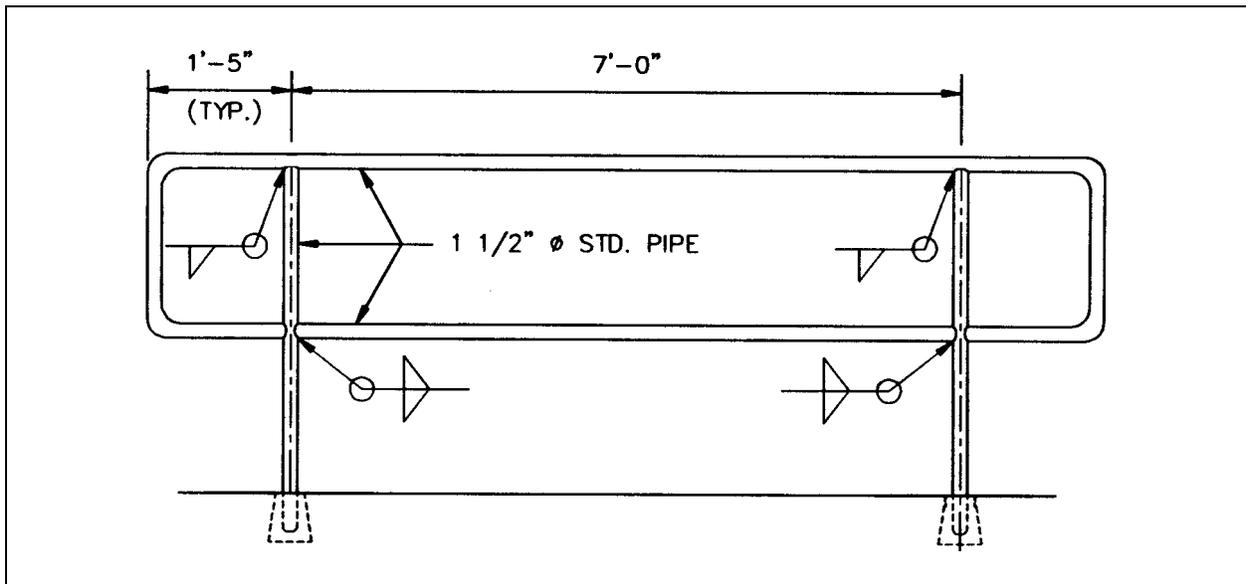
Steel handrail schematic (1 in. = 2.54 cm; 1 ft = 0.3 m)
